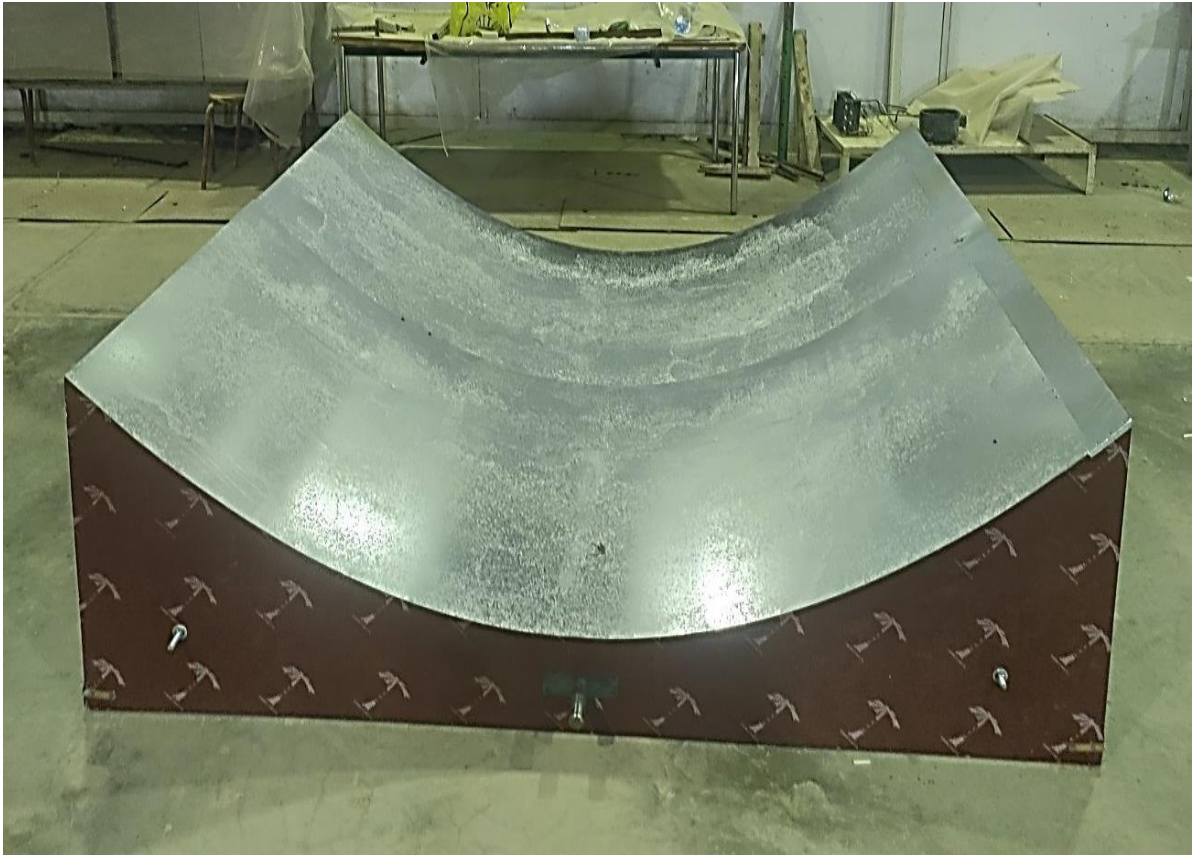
Parabola Mold with Thin Iron Plate Cover.
